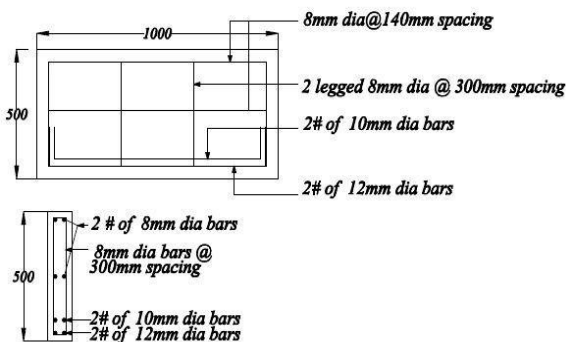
Details of tested 500 mm deep beam and testing arrangement
